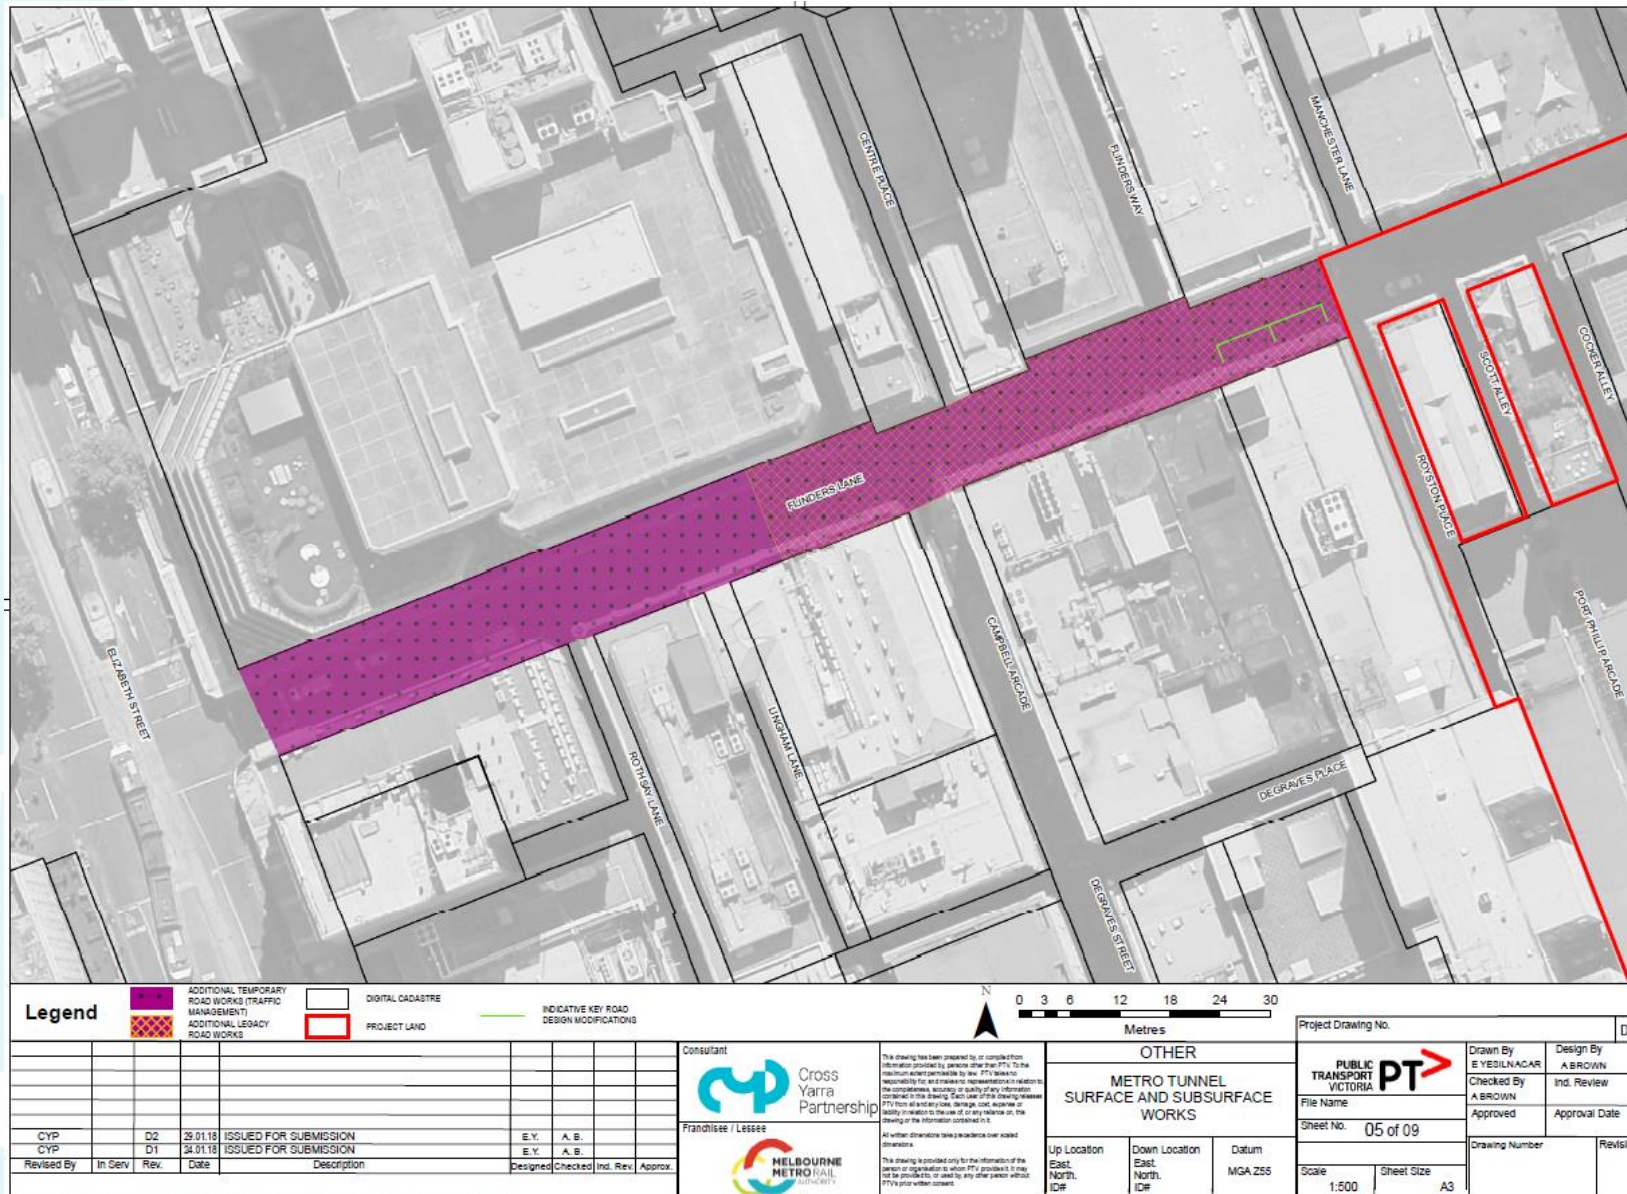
FLINDERS LANE ADDITIONAL ROAD SURFACE WORKS
